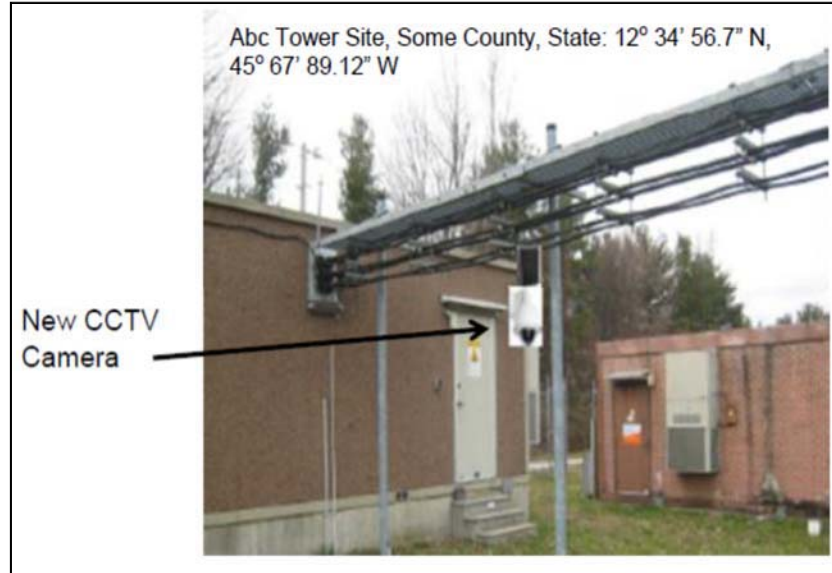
Ground-level photograph with graphic showing proposed equipment installation.
